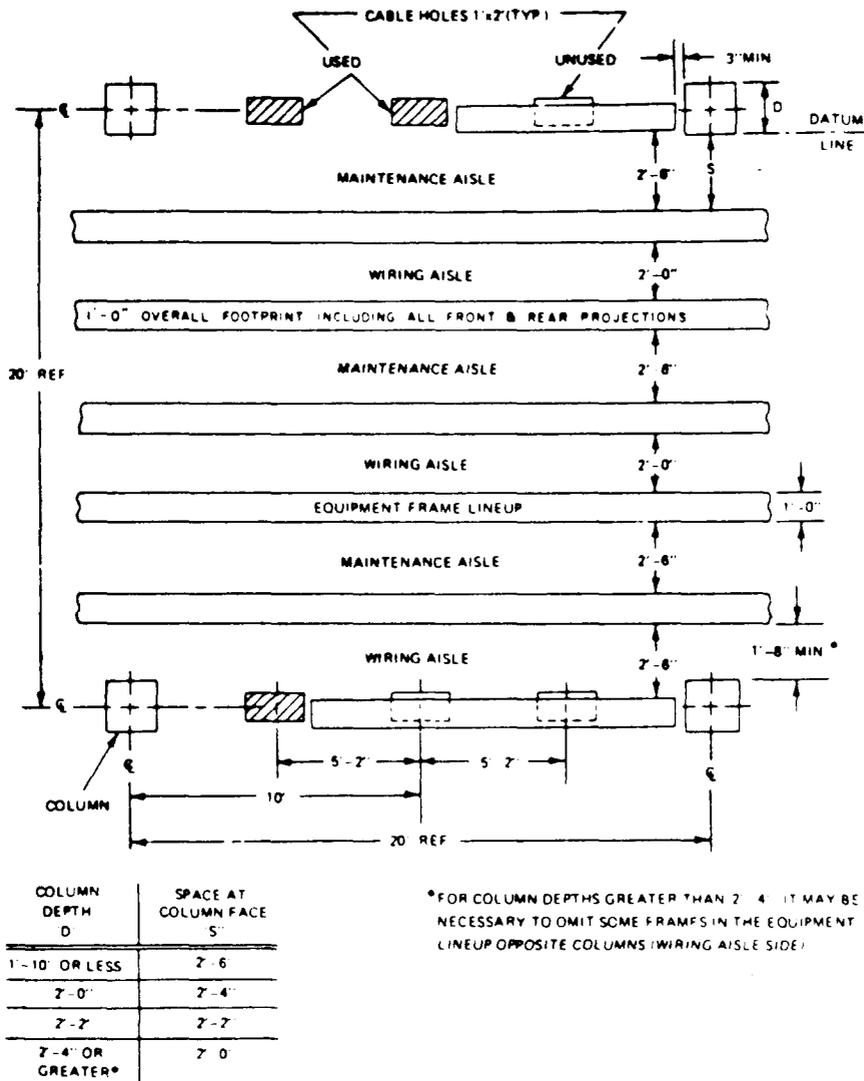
Typical Standard Floor Plan for Principal Depth (12-Inch) Frame
